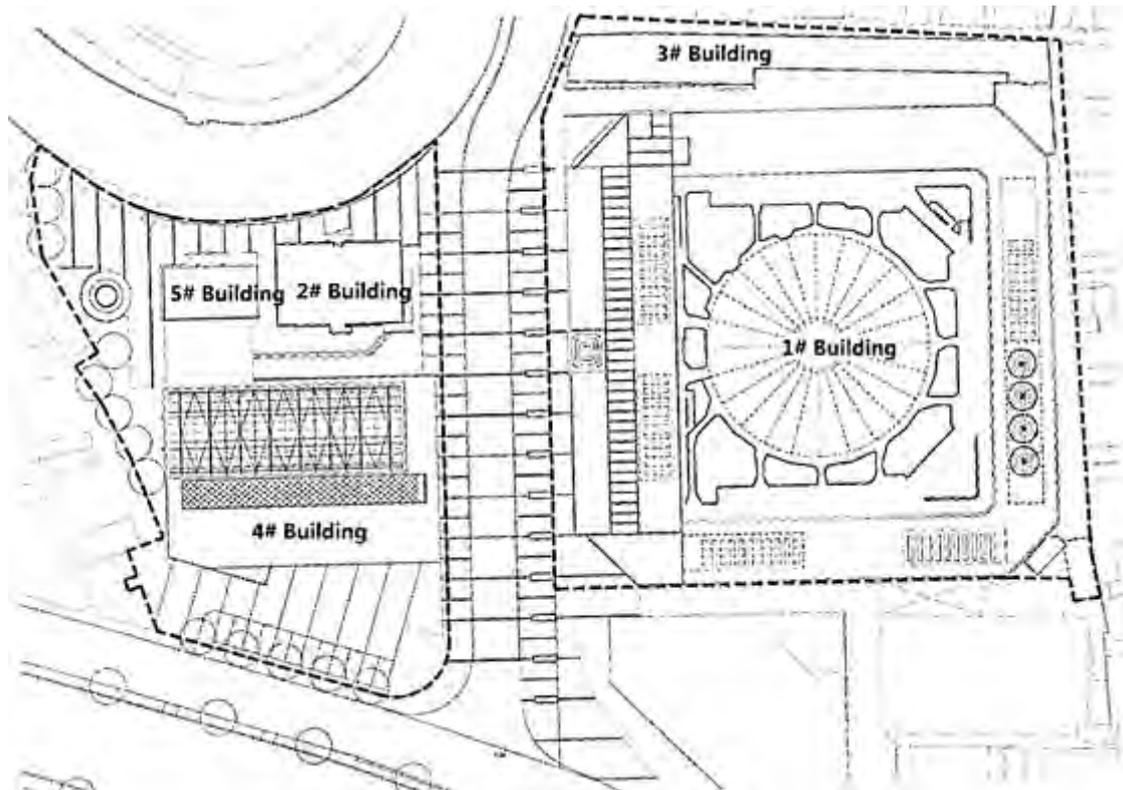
The general plan of the five buildings: 1# building -Shanghai Municipal Council Abattoir; 2# building-the original disposal plant; 3# building-the dog shed of abattoir; 4# building-the canteen and warehouse; 5# building-the boiler room (Source: by author. According to Chongxin, ZHAO, “1933 Old Mill,” *Architectural Journal*, 2008, 70–75)
